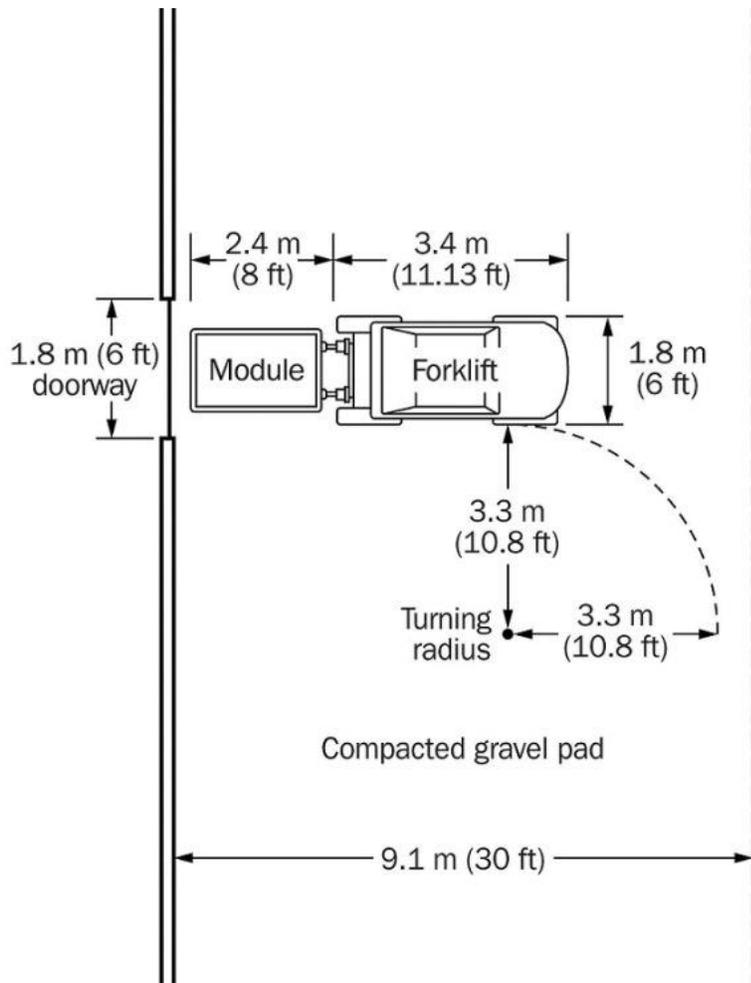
Schematic showing width of laneway needed for side door loading of second floor.
